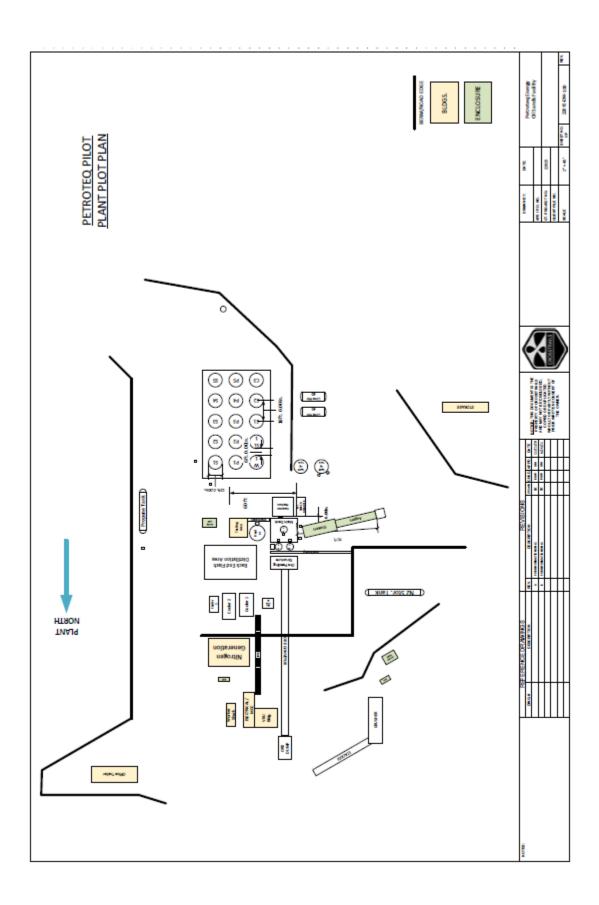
Site map/plan (2018 Aerial Photo) of Petroteq's oil sands extraction facility. The east-west and north-south cross sections of the stormwater basin are found in Figures 1e and 1f, respectively. Compare to aerial photograph, Figure 1d (2021 Aerial Photos).
